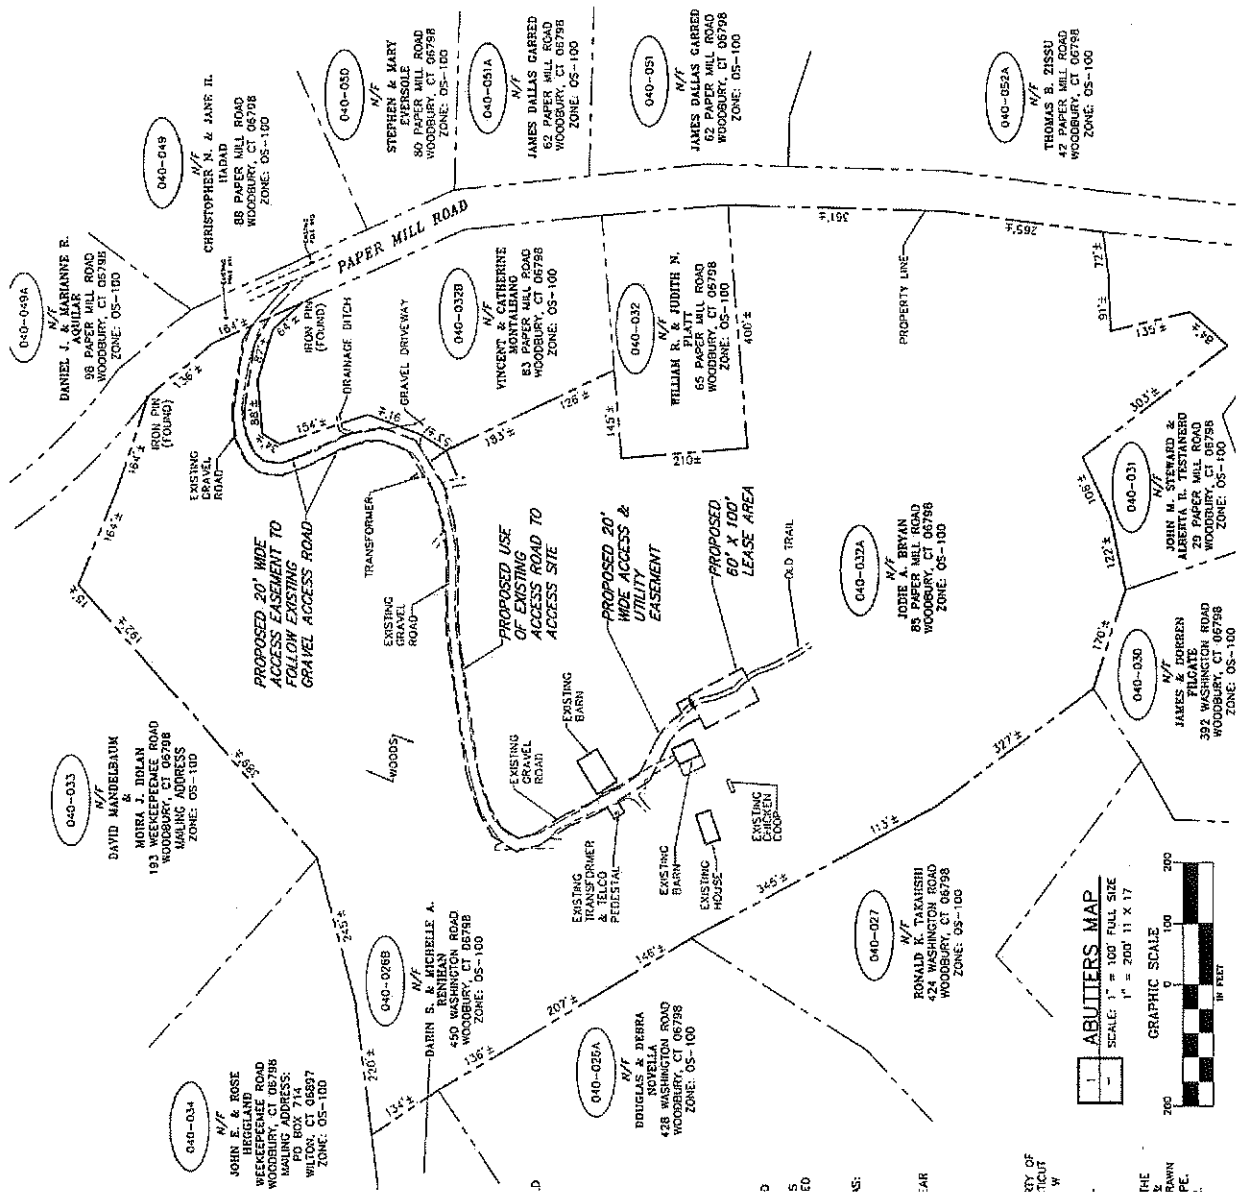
Location of site at 85 Paper Mill Road, Woodbury. (AT&T 1, Tab 3)
